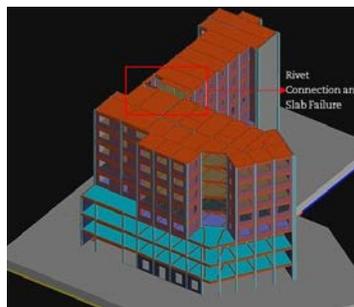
Partial Collapse after Continuing up the Shear Walls-70% Duzce Ground Motion
